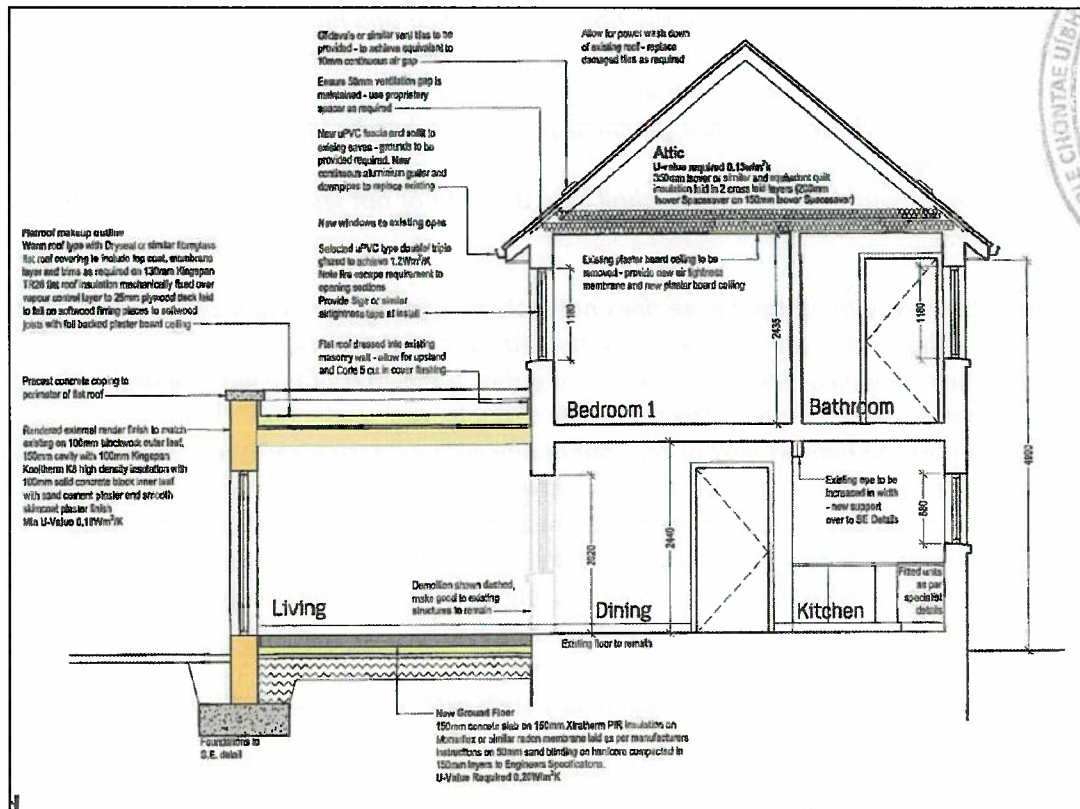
Proposed single storey extension to the rear of existing dwelling (as submitted).
